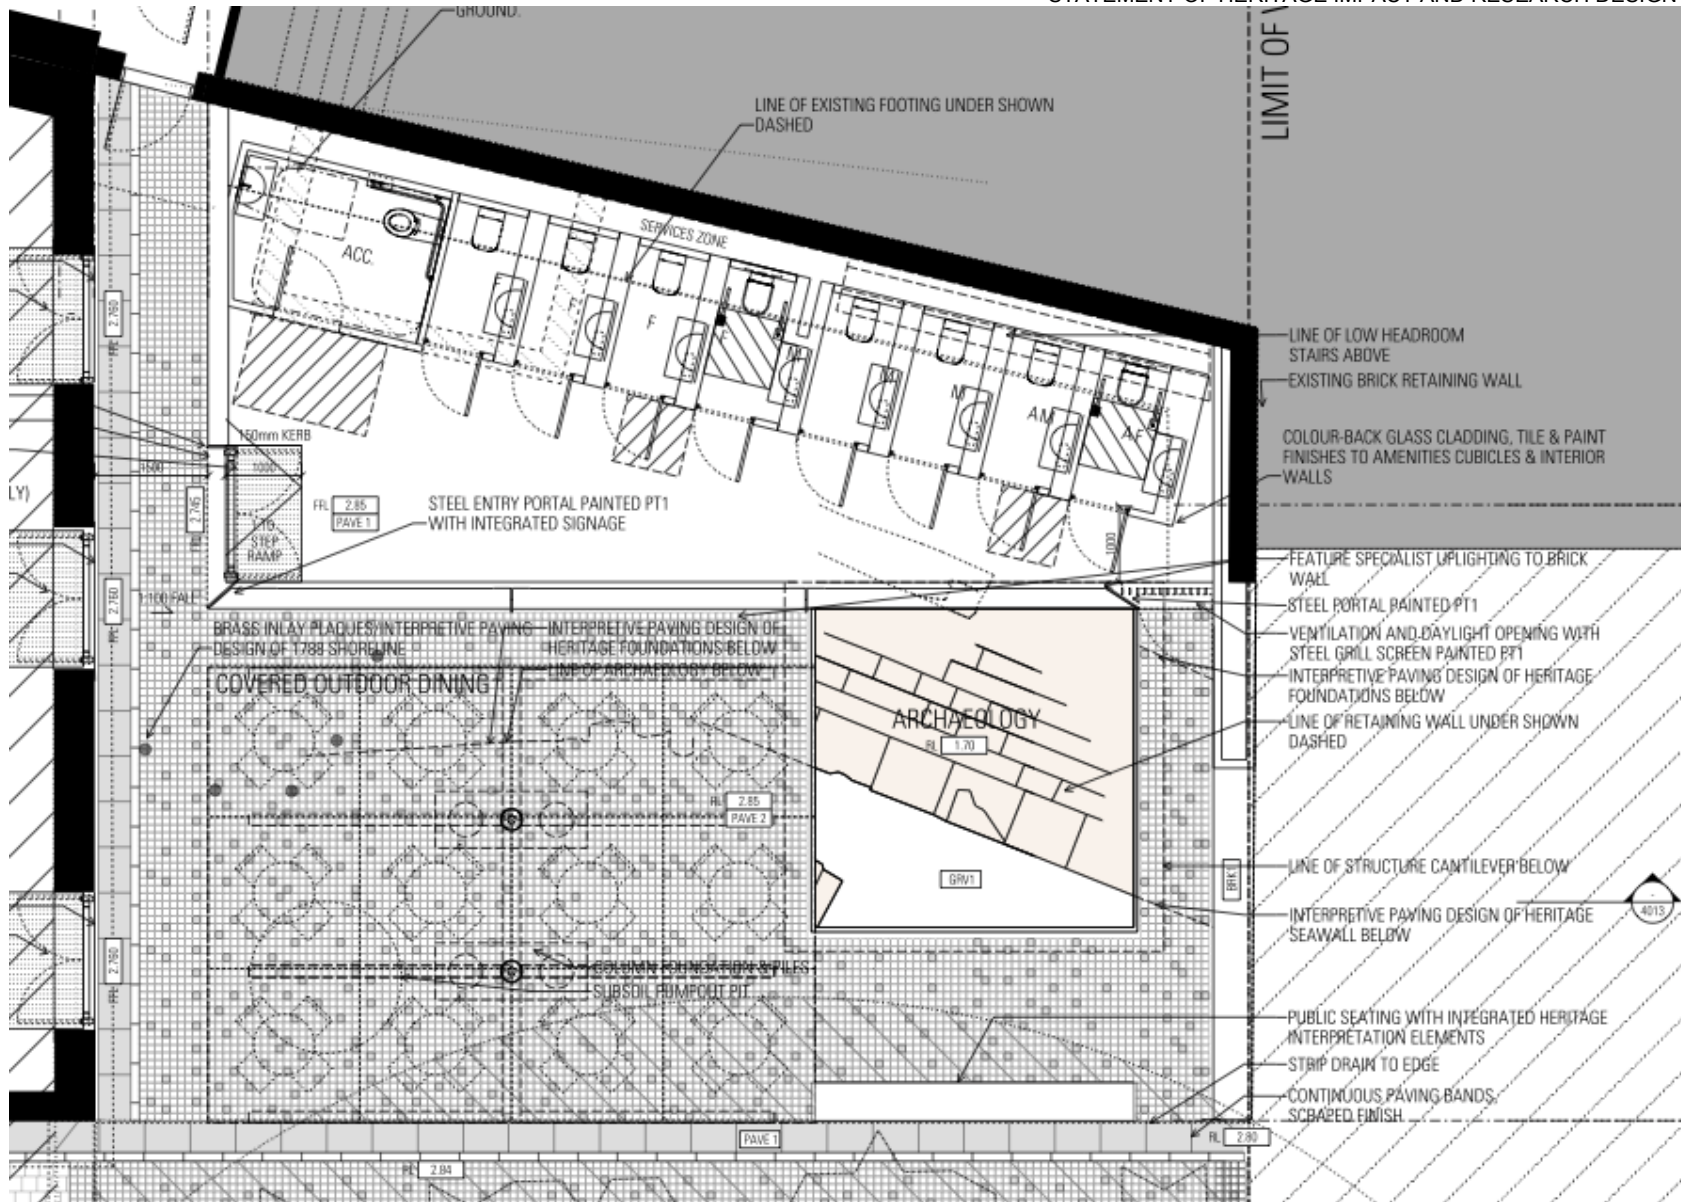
Bay 12 Redesign - Plan of Level 1. Note north is to rhs of page. (Detail from p32 JPW Design Statement)
